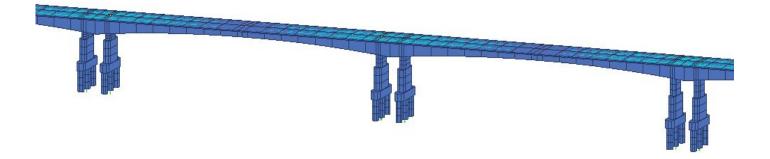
Construction stages and stressing were carried out using RM Bridge software
